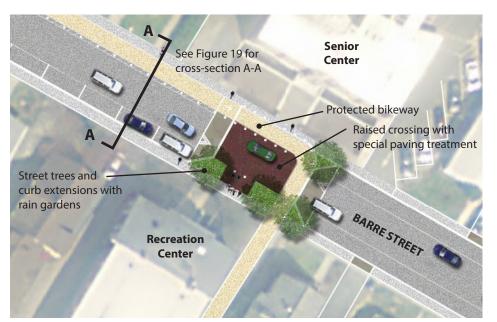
Detail of Barre Street design option at the recreation center, showing the protected bikeway and raised crossing.
